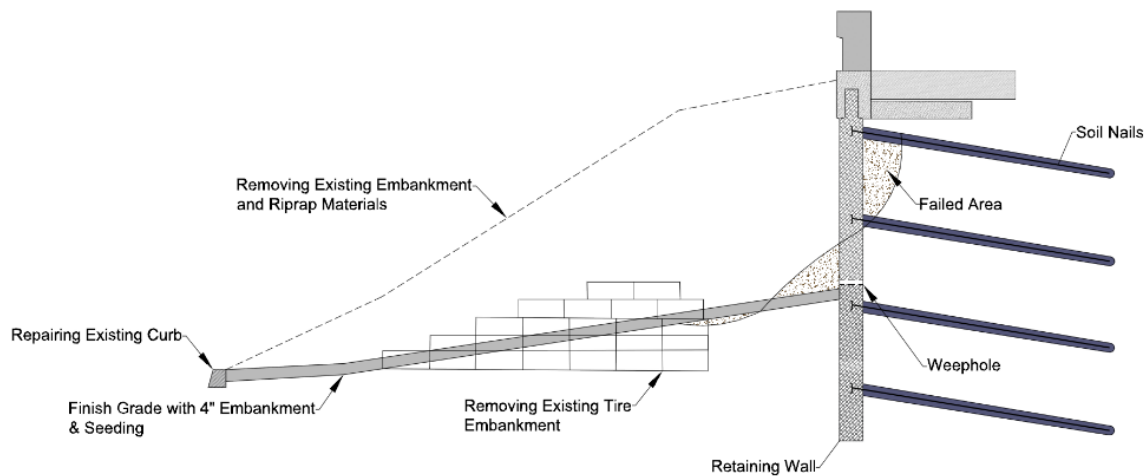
Schematic design of proposed retaining wall supported with soil nails
